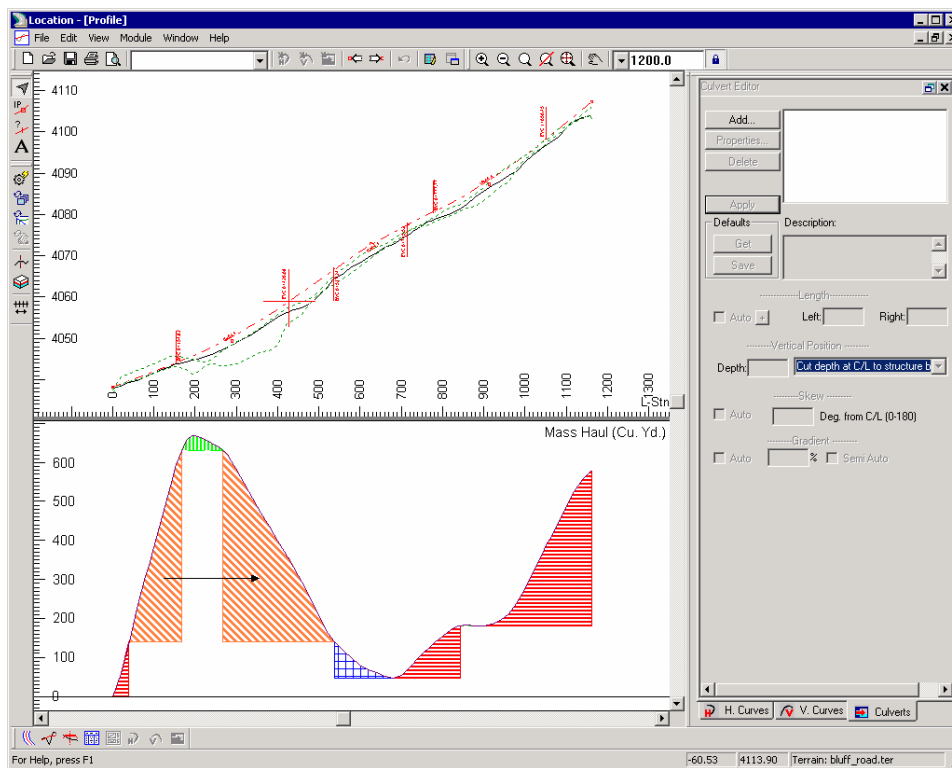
Mass Haul Showing Overhaul, Free Haul and Burrow/Waste
